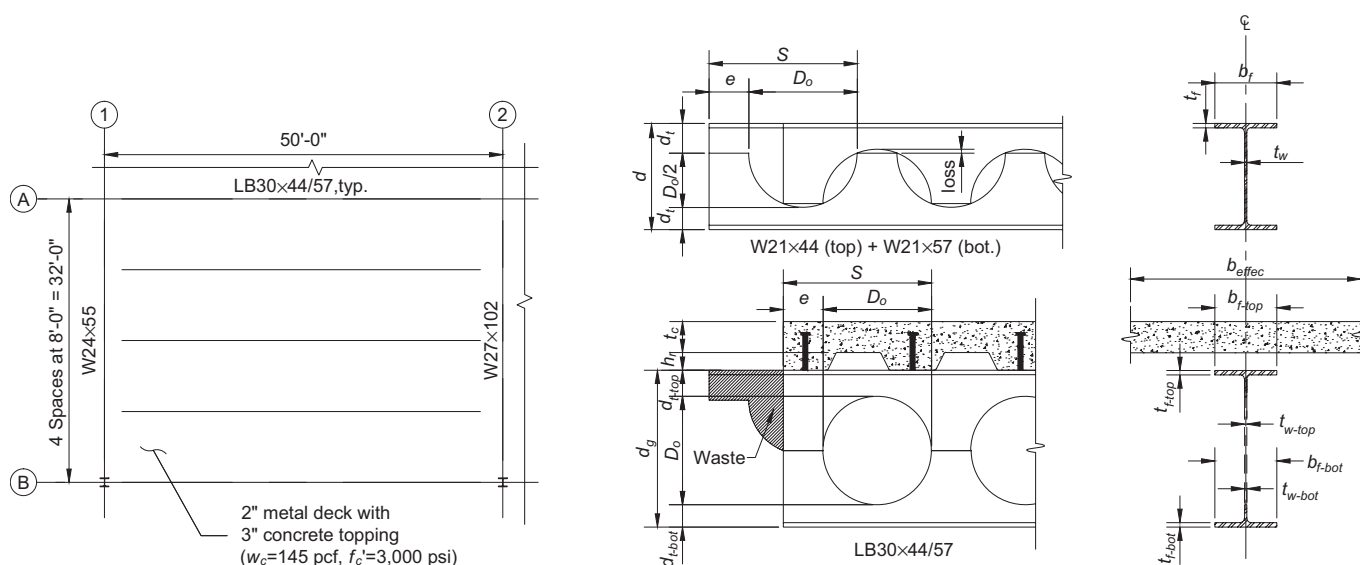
Structural framing layout and composite cellular beam nomenclature for Example 4.4.
